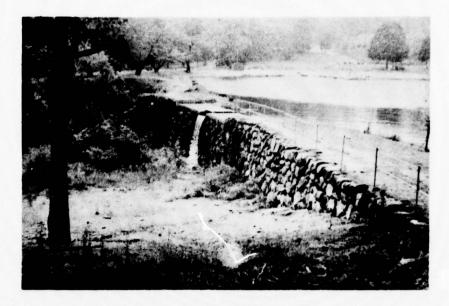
View of dam from left abutment showing original rock masonry dam.
